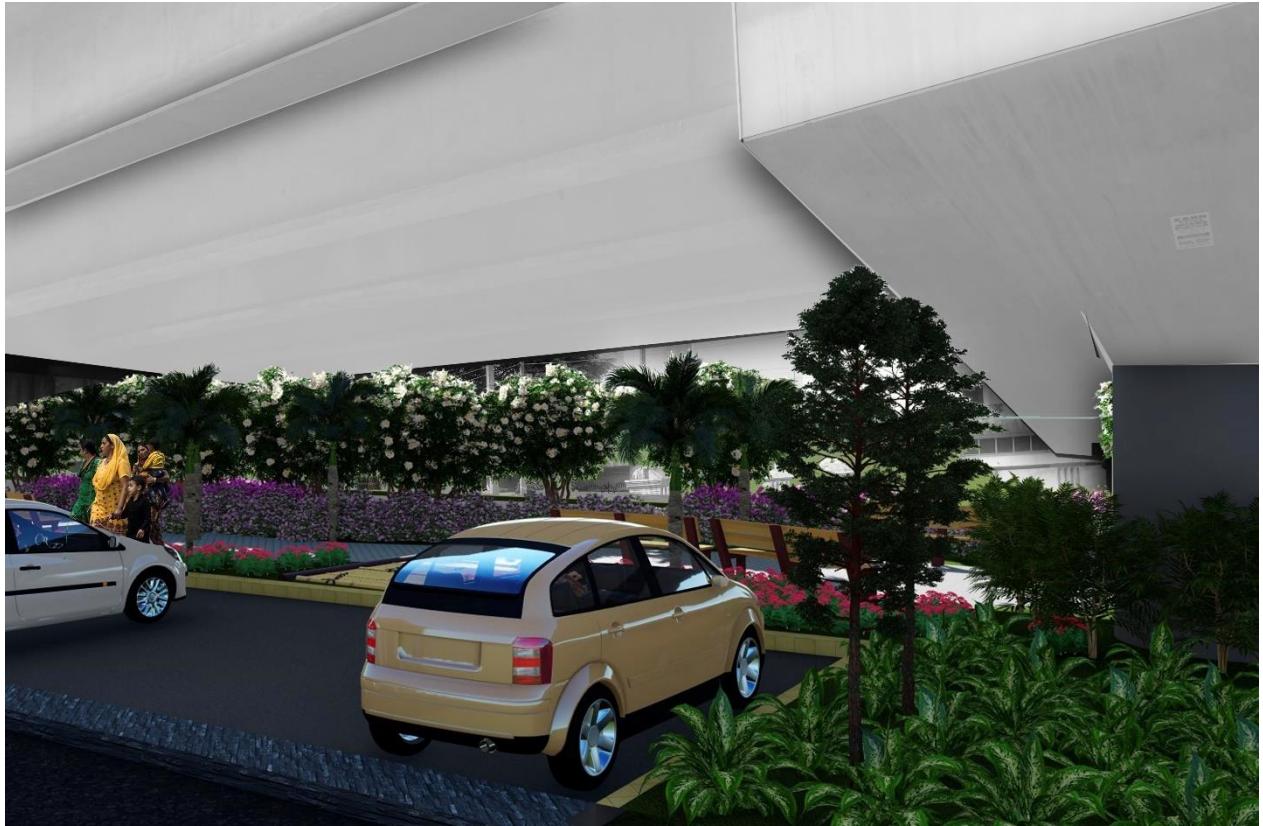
Proposed Planting near parking area at Zone 3 below Kichlu Flyover on Court road.
